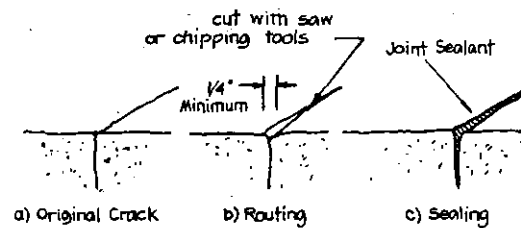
Repair of crack by routing and sealing is a method suitable for cracks that are dormant and not structurally significant. Routing and cleaning before installing the sealant add significantly to life of the repair.
